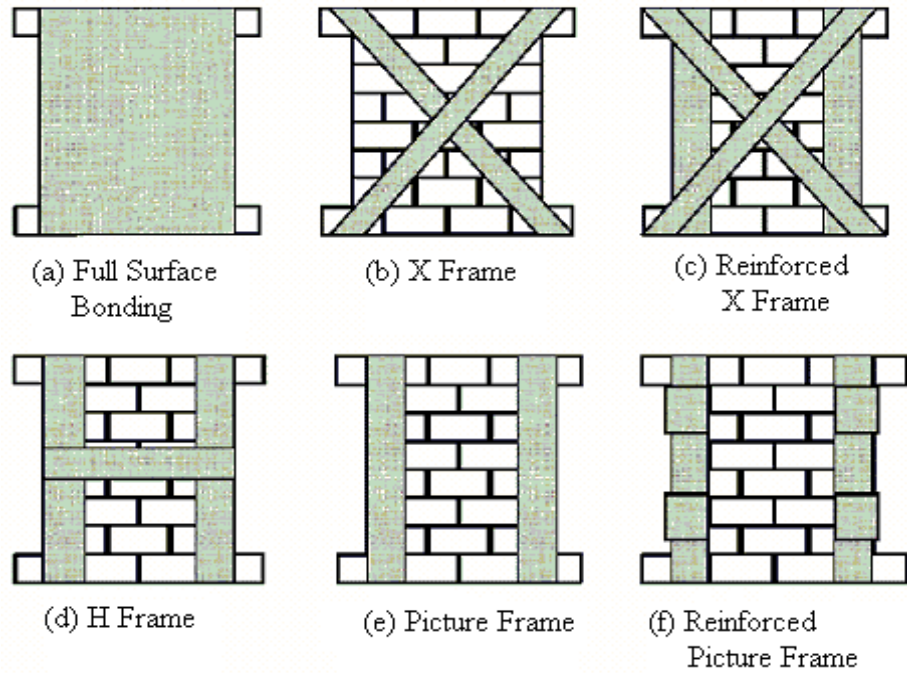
Configurations of FRP laminates for retrofitting of masonry walls
